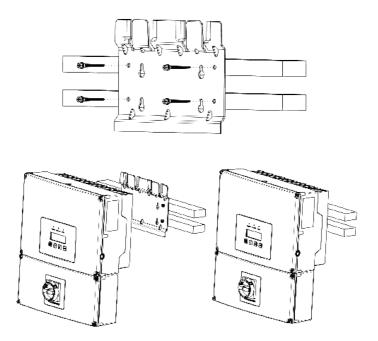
Installing the mounting bracket and inverter on a wooden stud wall
